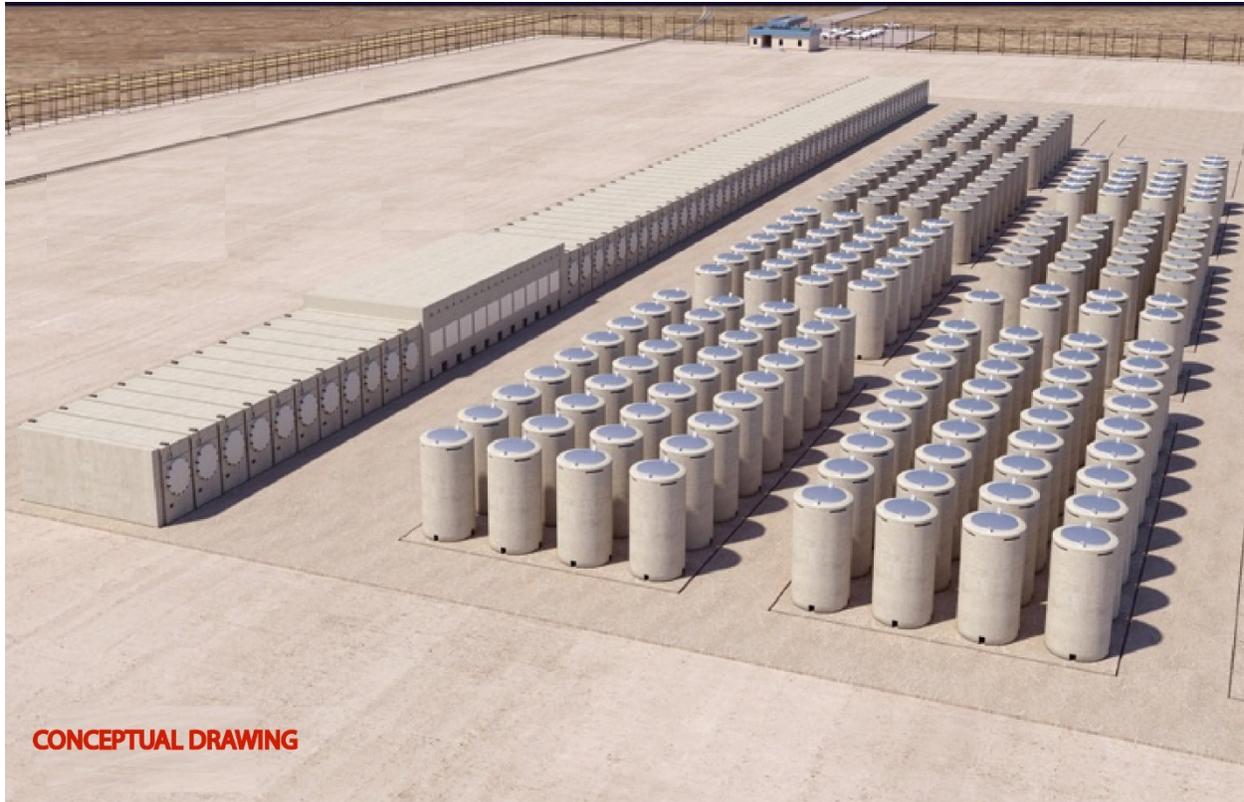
Exhibit C. Pictorial View of Proposed Project (Source: Modified from WCS)
